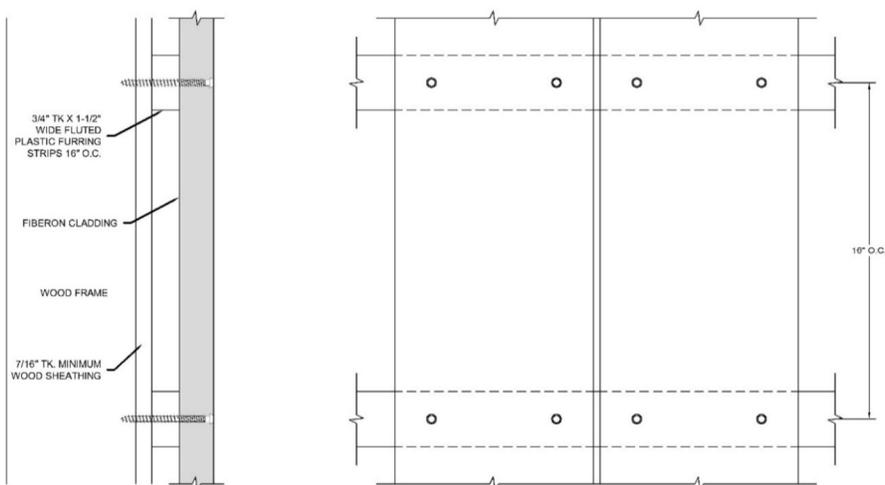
VERTICAL INSTALLATION OF FIBERON CLADDING BOARDS
